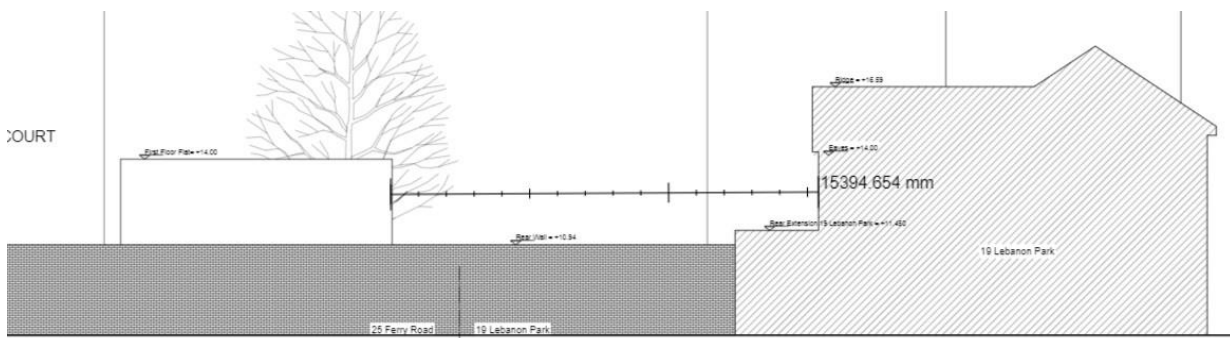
Existing rear elevation (extract from submitted drawing SC-PP2-03 Existing Elevations)
